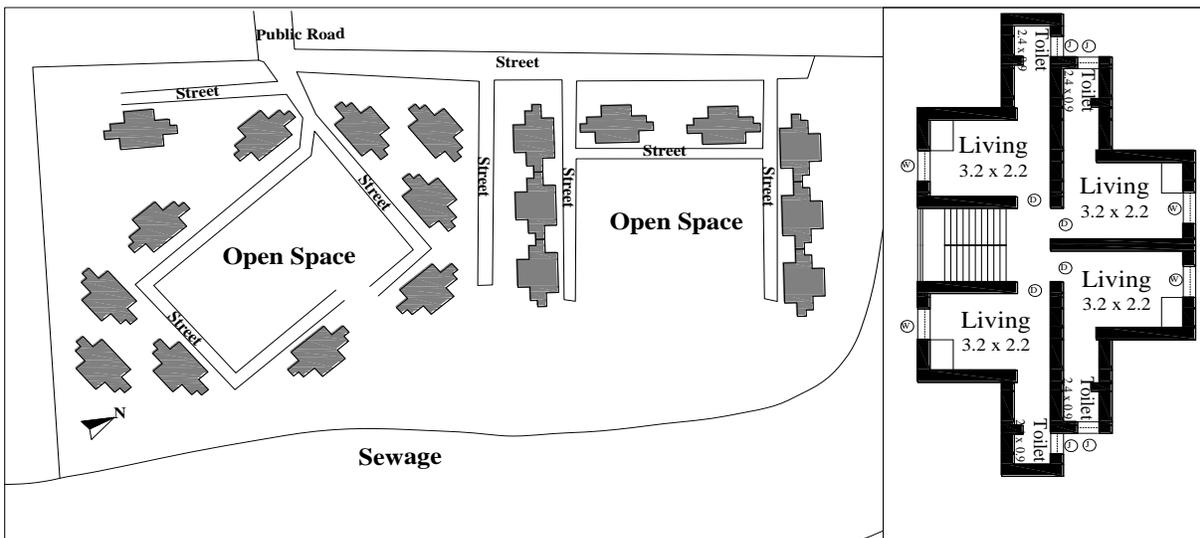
Site Layout of Public housing at EllisNagar, Madurai and Figure 5. Typical Floor Plan – Ellis nagar Housing
